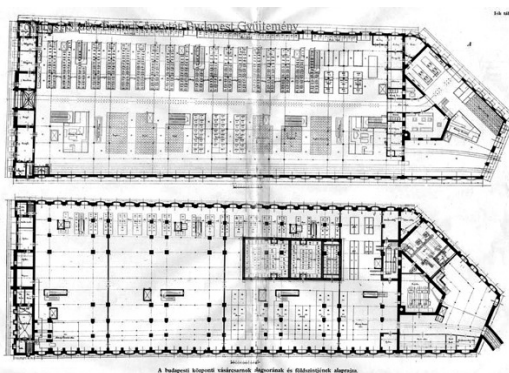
Plans of Central Market Hall in Budapest (source: [23])
